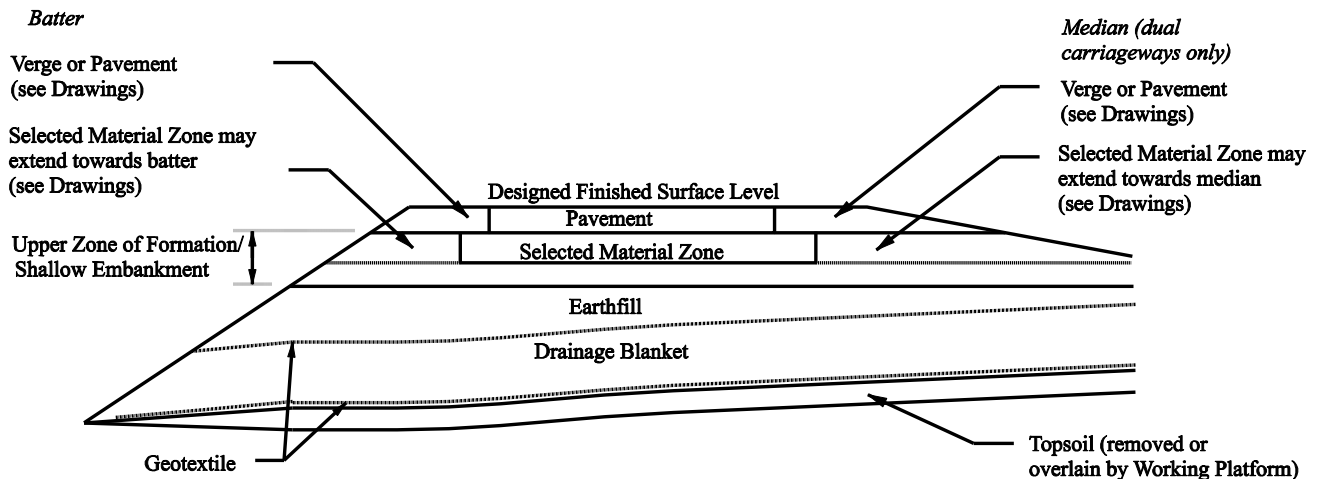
(e) – Embankment Foundation Treatment – Type E5
